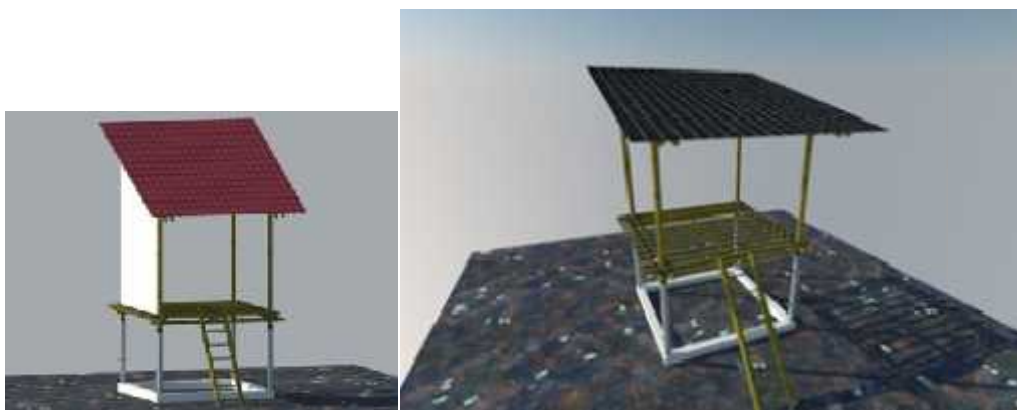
The Design of Hydraulic Adaptive House Using Bamboo Material [2]
